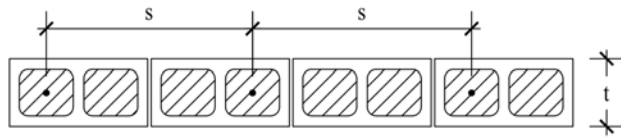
Schematic plan for grouted reinforced masonry wall
